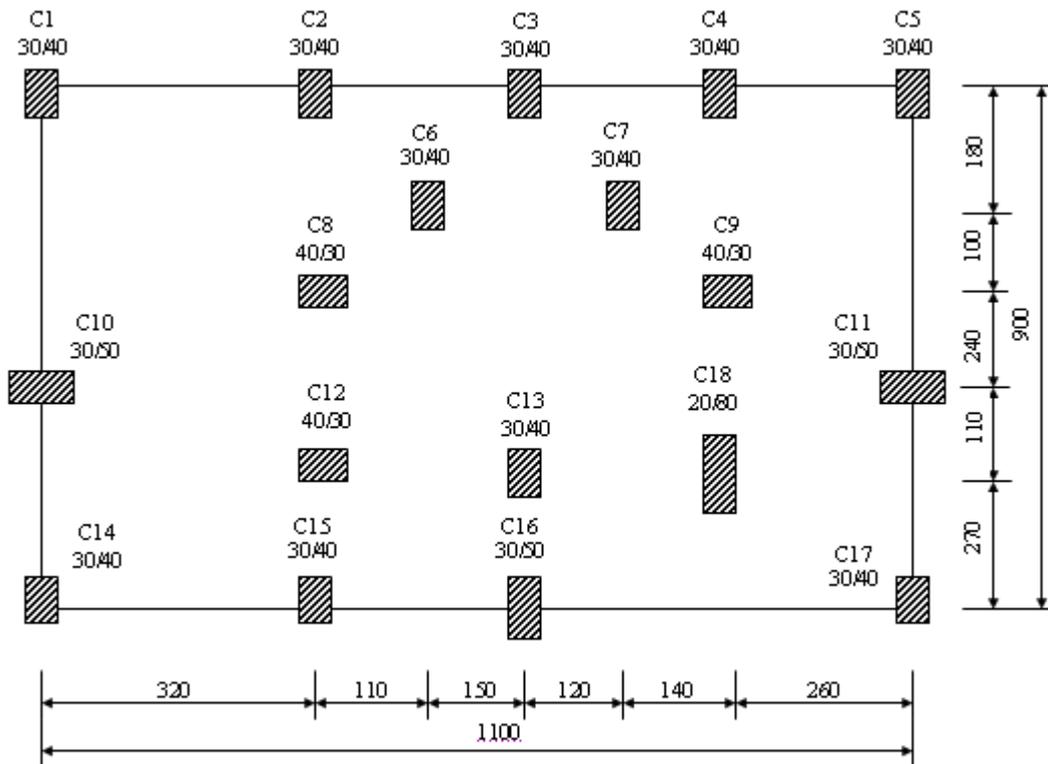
Ground storey floor plan of the building (dimensions are in cm)
